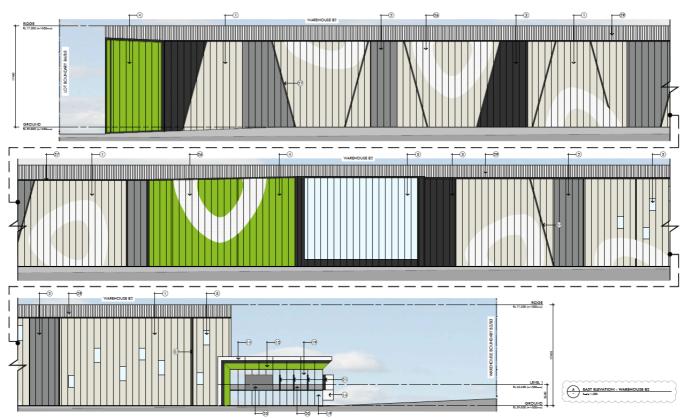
Warehouse B2 Eastern Elevation - As Proposed
